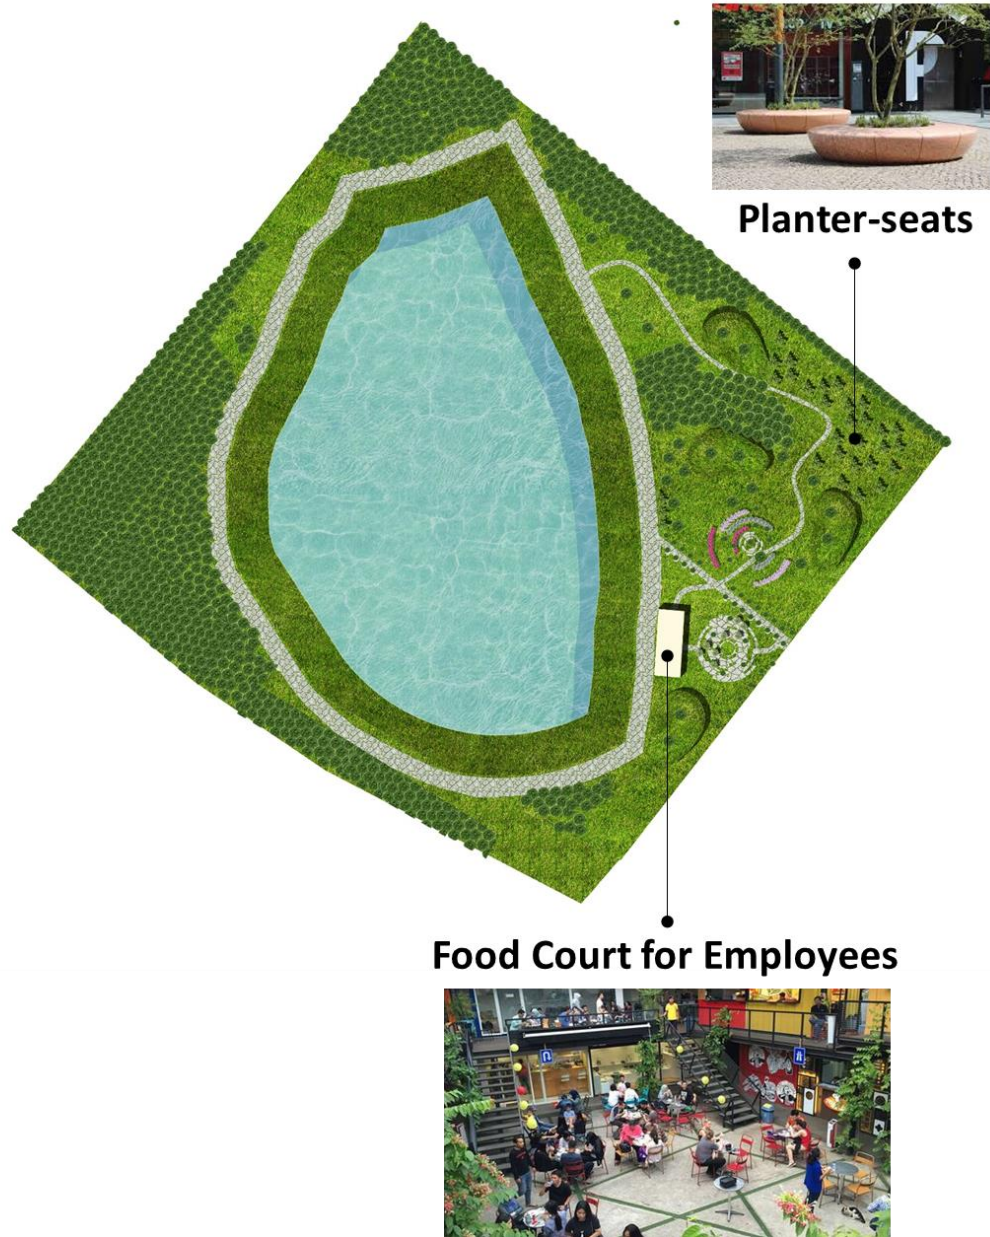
SCHEMATIC LANDSCAPE LAYOUT FOR KIA
